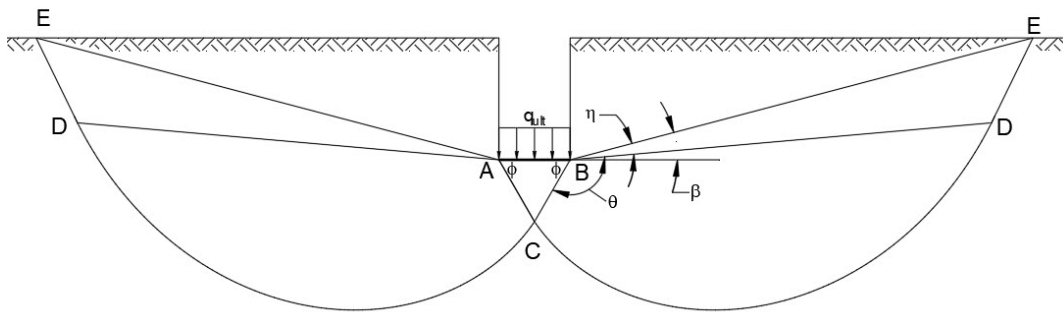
Shallow Foundation Shear Pattern (Meyerhof 1953)
